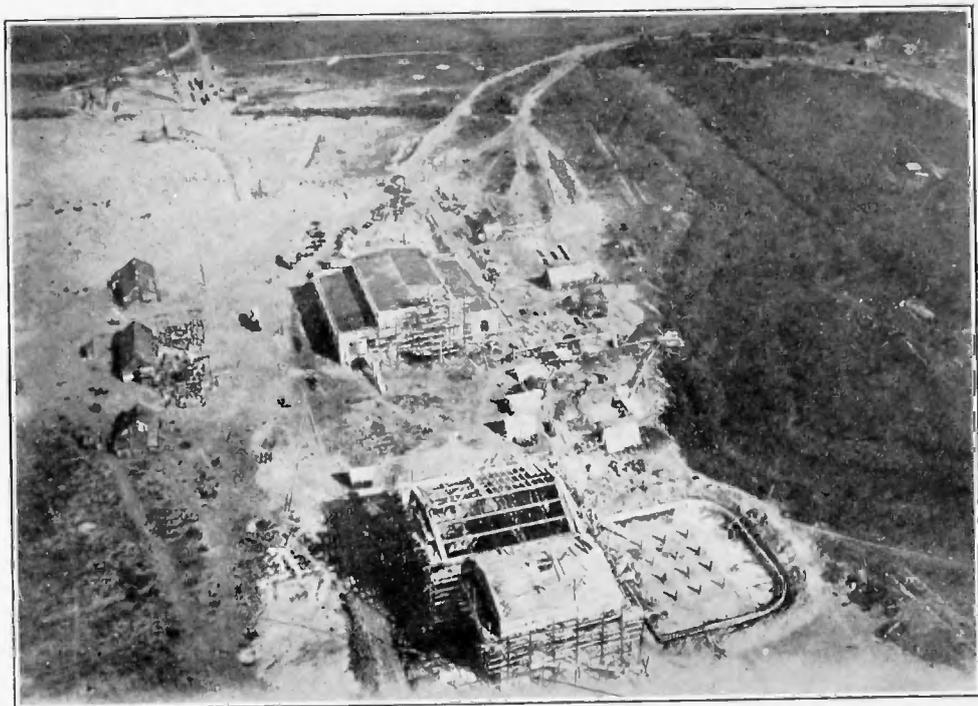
Aerial View of Radio Building and Power House Taken From Top of Tower Nearest Station; Taken During Construction of Buildings
